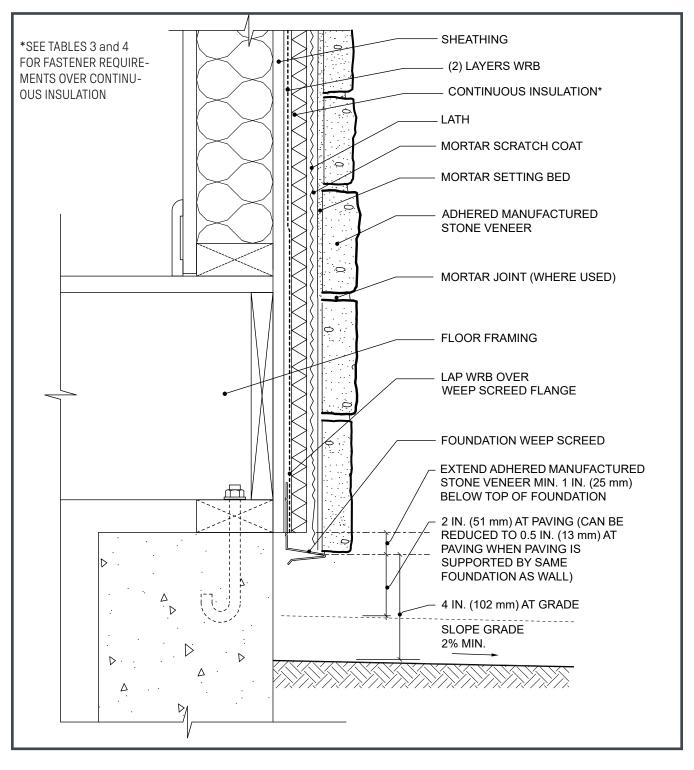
Foundation Wall Base - AMSV Overlapping Foundation
